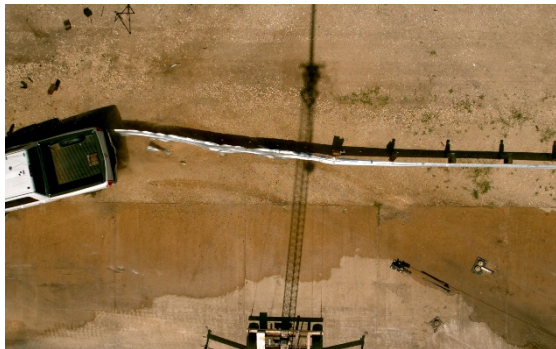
Sequential Photographs for Test No. 612281-02-2 (Overhead and Frontal Views).
